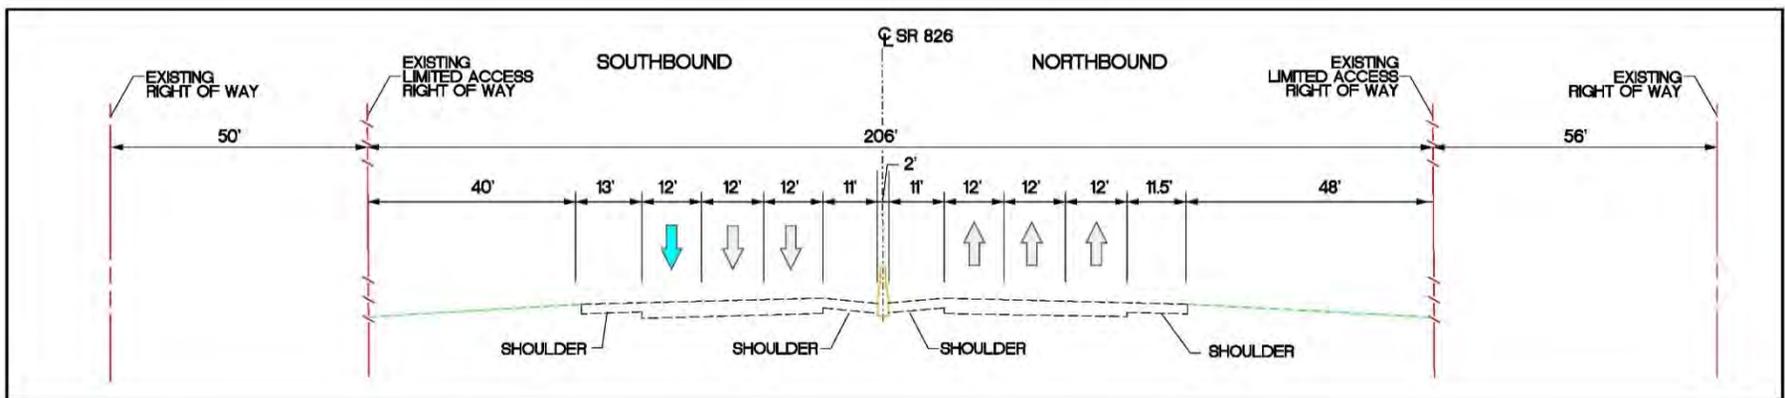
Existing Roadway Typical Section between US 1 and SR 874
